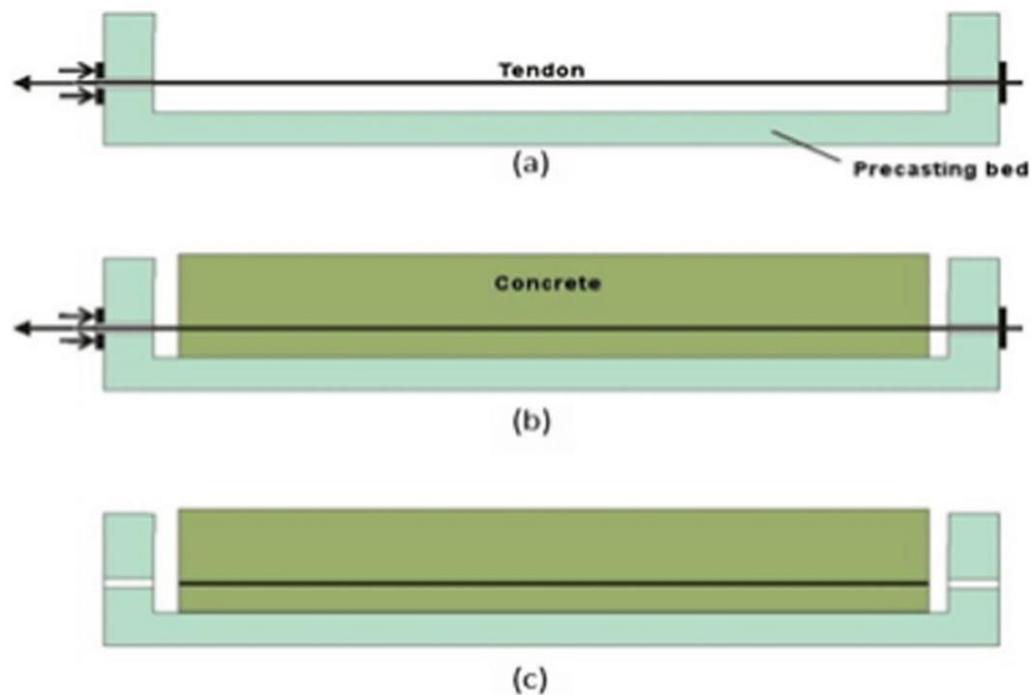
Longitudinal Section of a Prestressed Concrete Girder by Pre-tensioning
